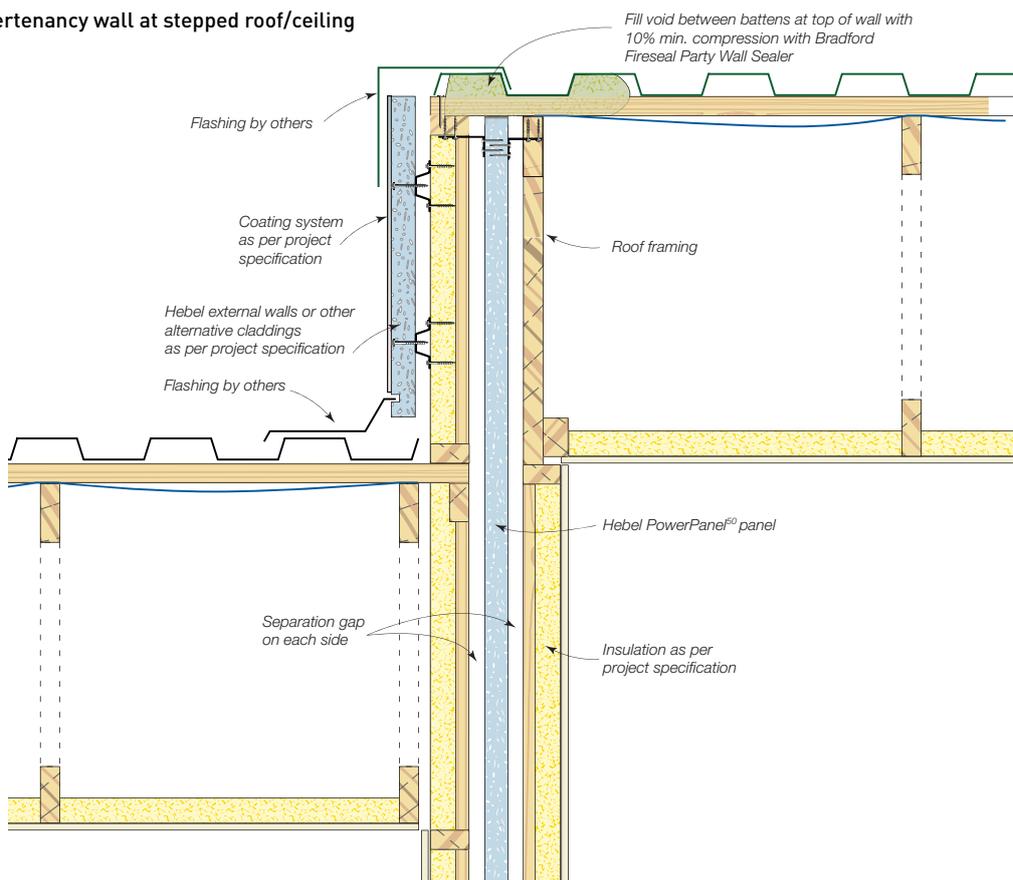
Hebel Intertency wall at stepped roof/ceiling
